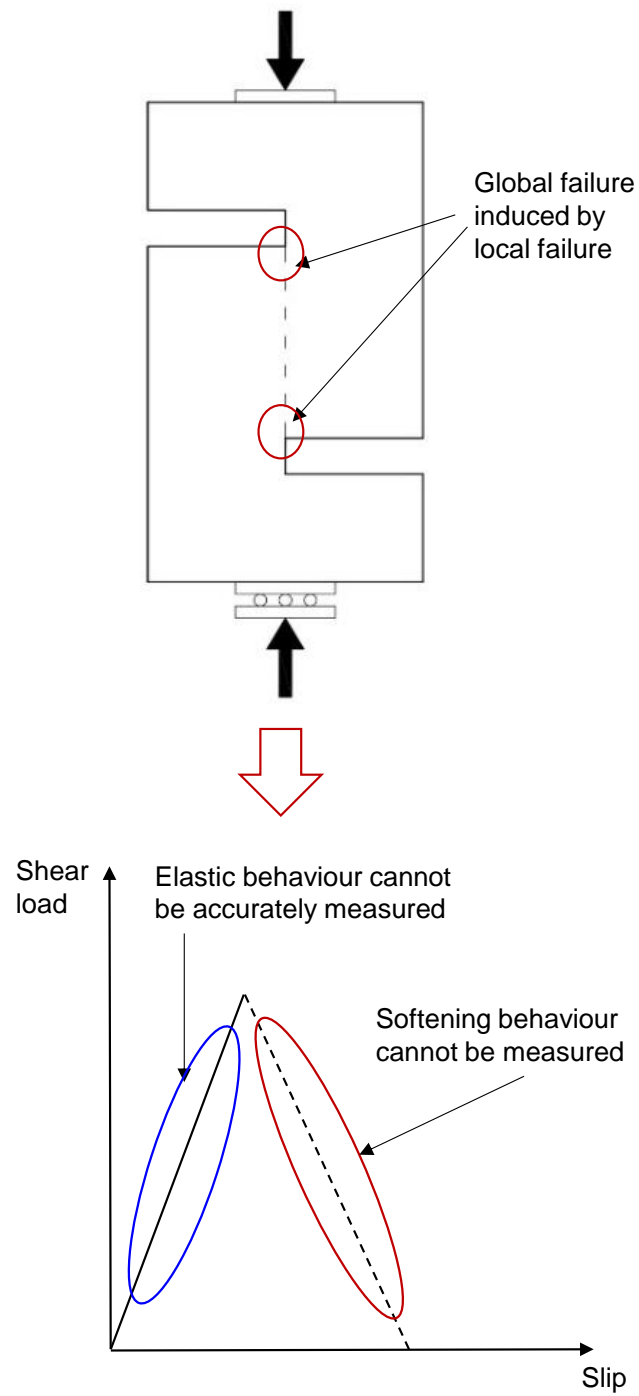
Brittle interfacial failure for a specimen without dowel reinforcement
